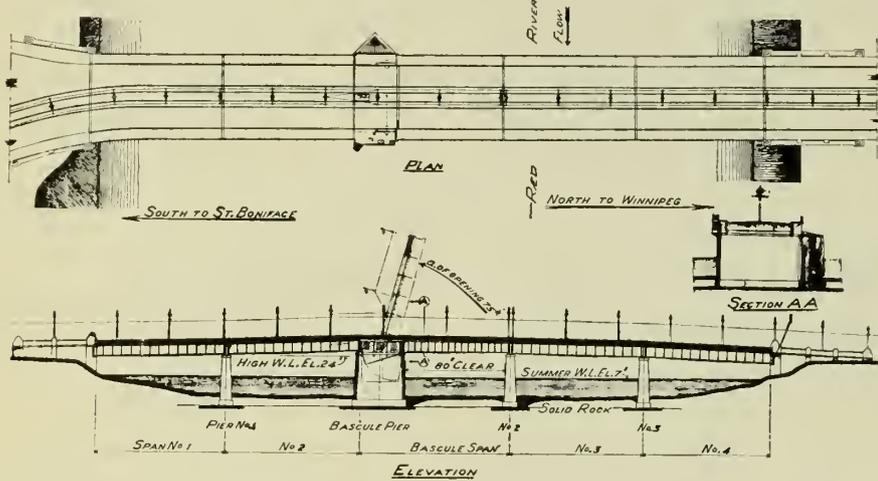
Plan and Elevation of Norwood Street Bridge.
